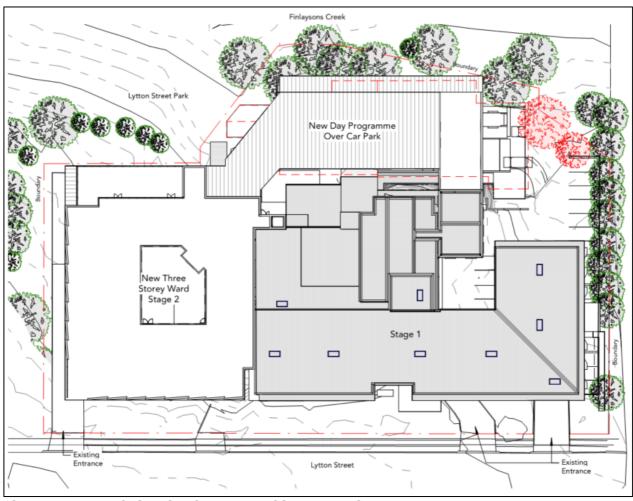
Proposed Site Plan (Team 2 Architects 2021)
